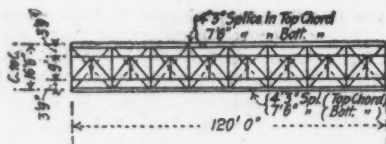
Diagram Plan Showing Location of Splices in Top and Bottom Chords, 120-ft. Pony Truss, Northern Pacific Ry.
